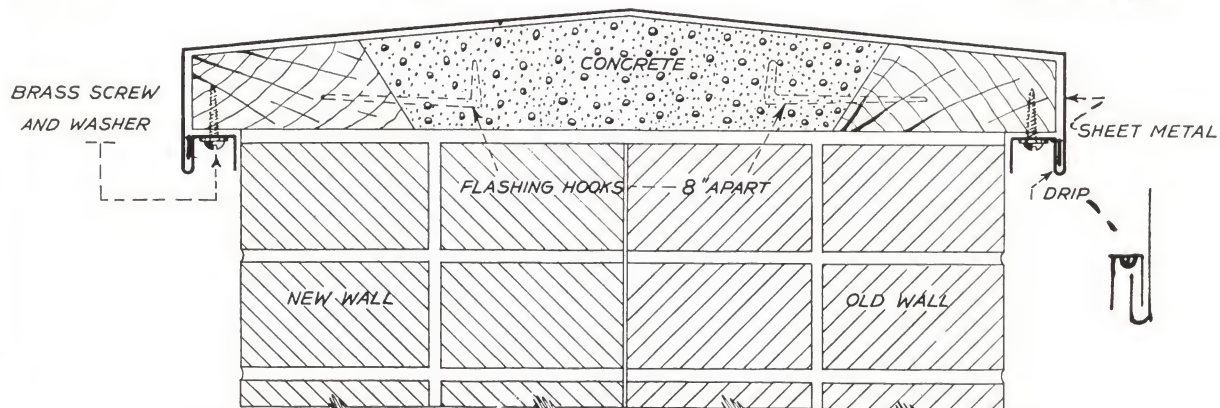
SHEET METAL COPING ON OLD WALL BELOW NEW WALL
